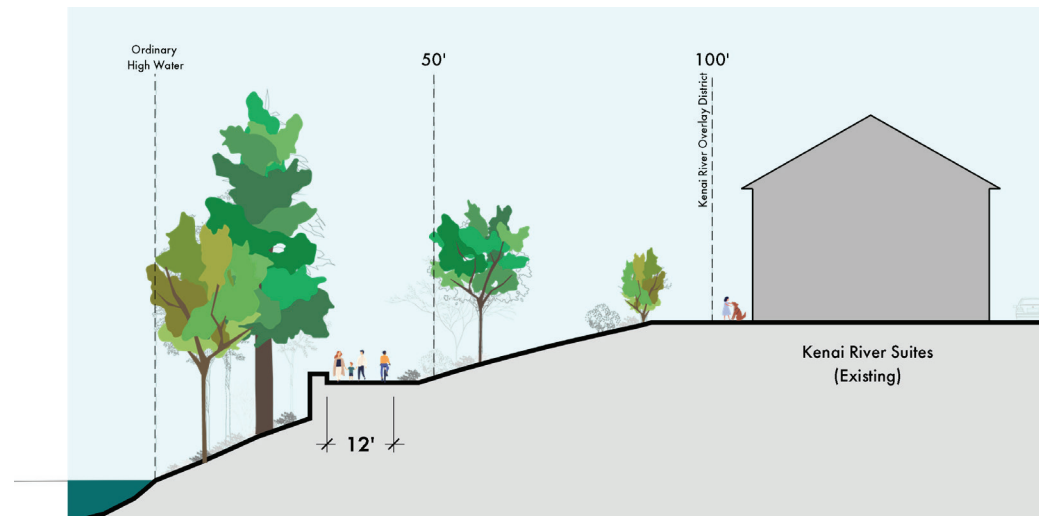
Proposed Section: Multi-Use Trail and Easement
